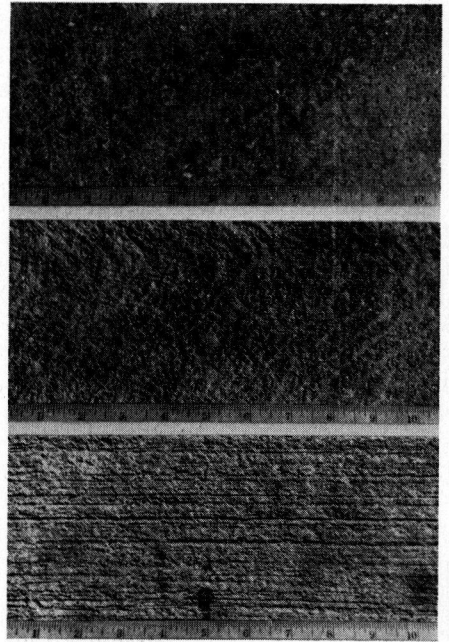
Close-Up Photographs of Portland Cement Concrete Road Surfaces. (Upper) Belted Concrete Worn Smooth by Traffic on U.S. 24 in Kansas, (Center) Coarse Sandy Belted Concrete on U.S. 50S in Kansas, and (Lower) Broomed Concrete on U.S. 54 in Missouri.
